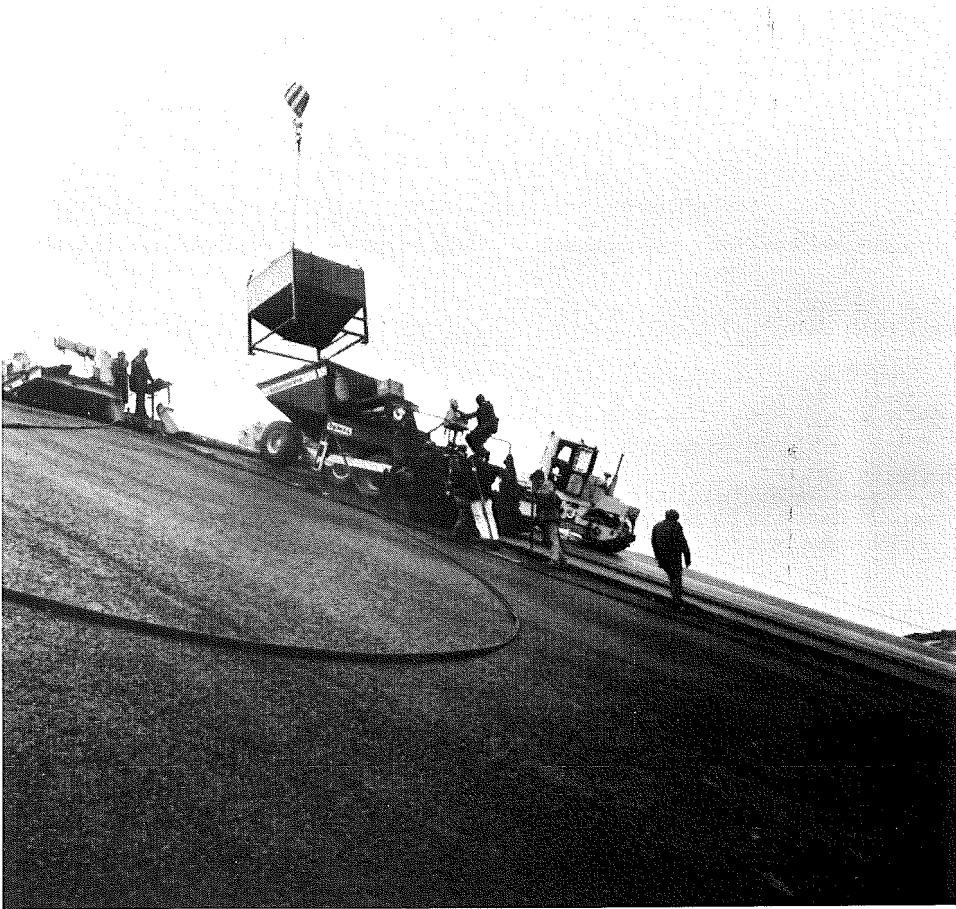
Construction of an asphaltic concrete revetment using a finisher adapted for use on a slope
